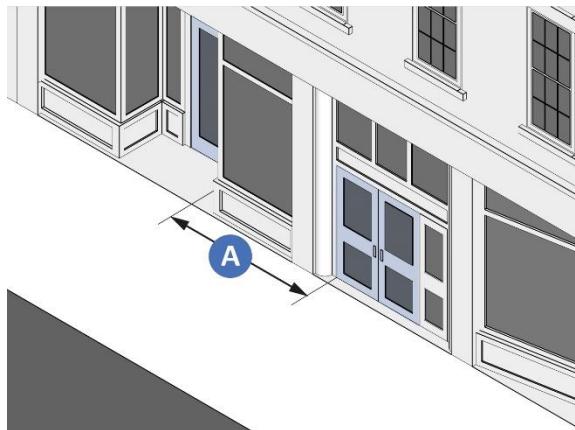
Pedestrian entrances should be spaced (A) no more than 20' feet apart within a single street facing building.
